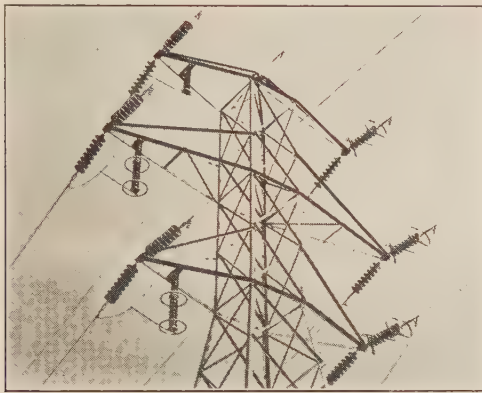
WESTINGHOUSE TYPE LINE ARRESTERS MOUNTED ON DEAD-END TOWER
